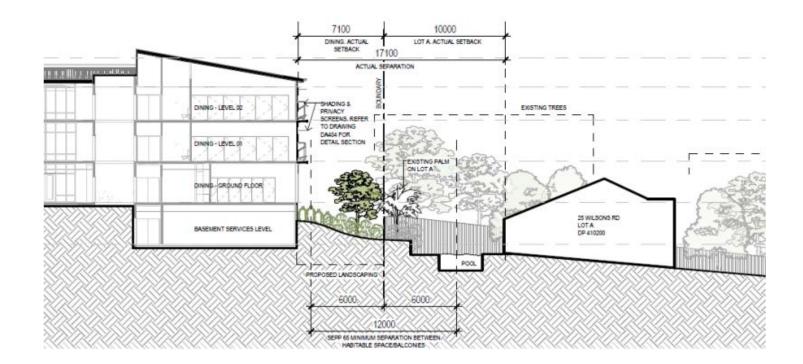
Cross-section from the proposed building to the dwelling at H/No. 25 Wilsons Road
